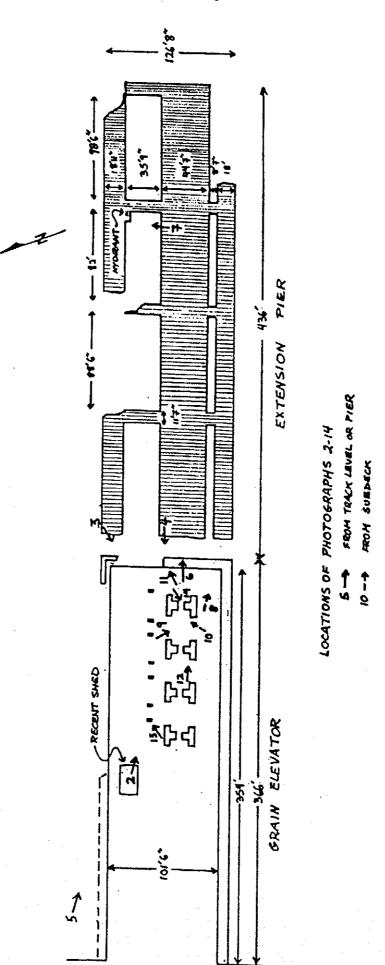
SKETCH PLAN OF REMAINS AT PIER 7, WITH PHOTOGRAPH LOCATIONS, JULY 1984
